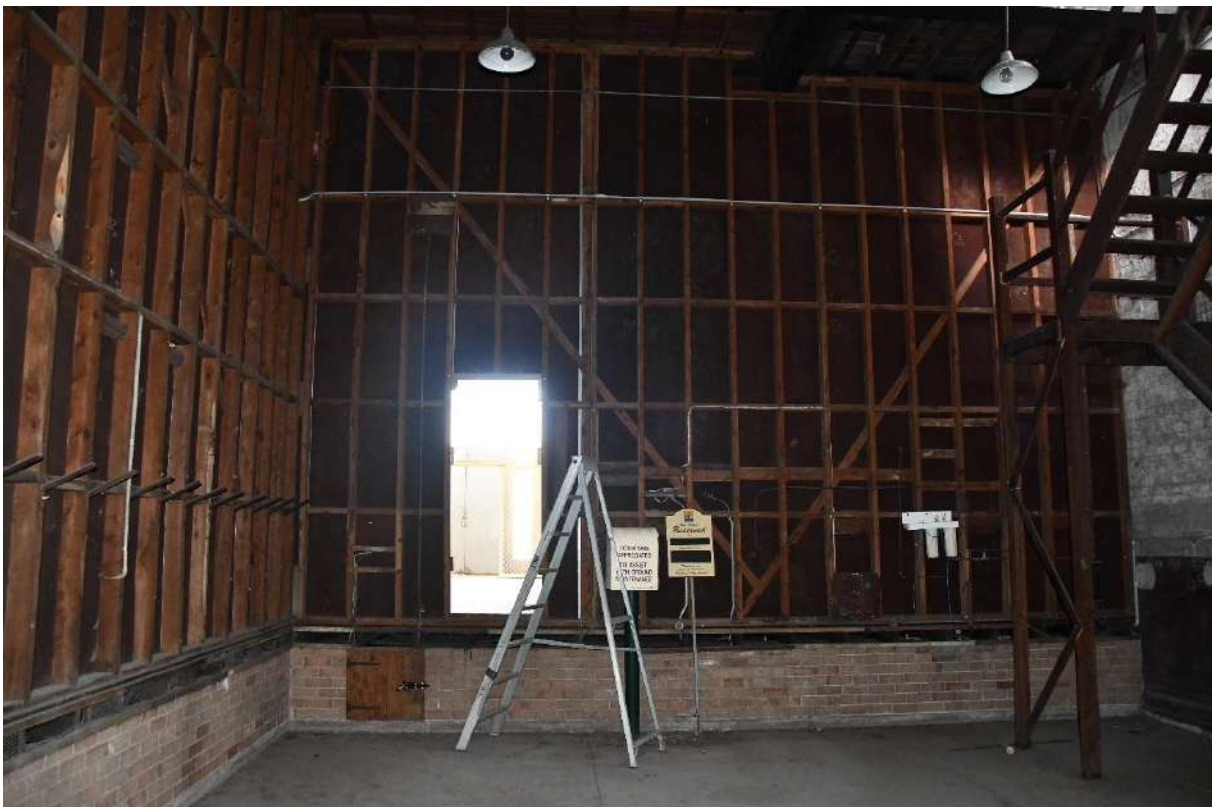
Rear room of Main Pumphouse (A) with 1950s concrete floor and timber partitions. The elevation in floor level is evident
